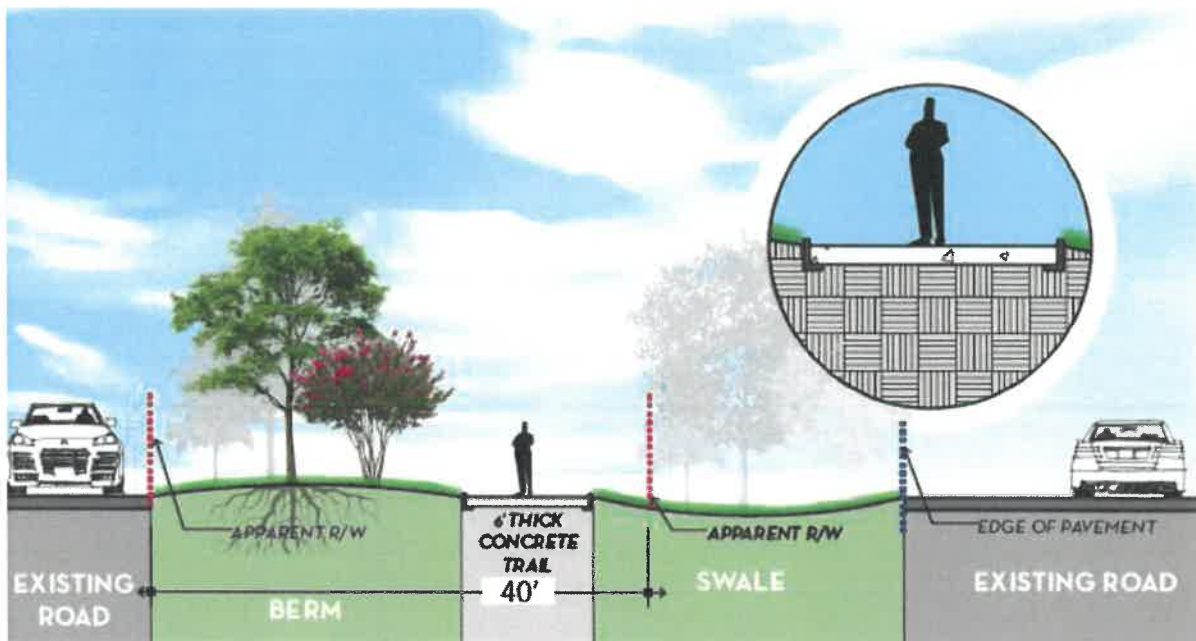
At-Grade Trail for Low-Elevation Areas
